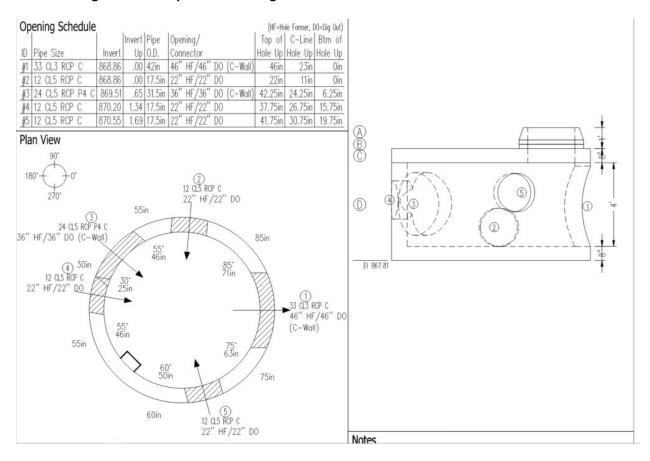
Excerpt from approved precast shop drawings for Storm Sewer Manhole Structure MH-2
